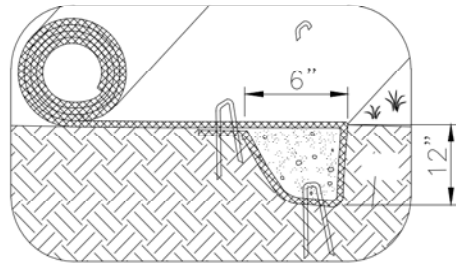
EXHIBIT "C" (Stormwater Pollution Prevention Plan)
